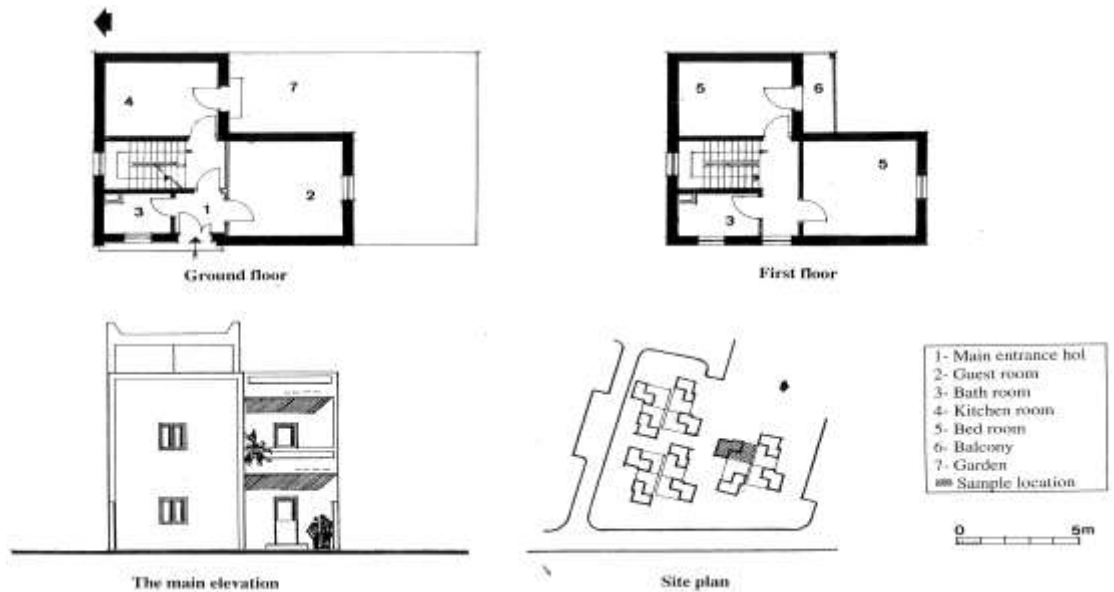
Plan of single hose type three bedroom modern Ghadames house
